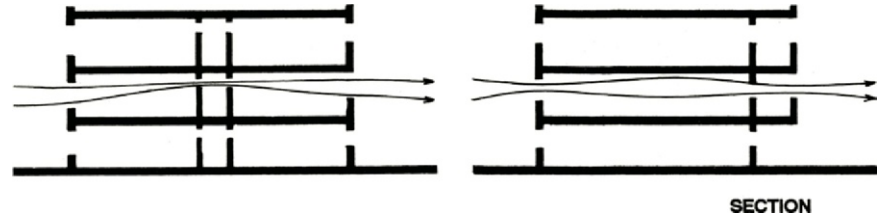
b In regard to natural ventilation, single-loaded corridor plans (right) are far superior to double-loaded plans (left), even if transoms are used.
